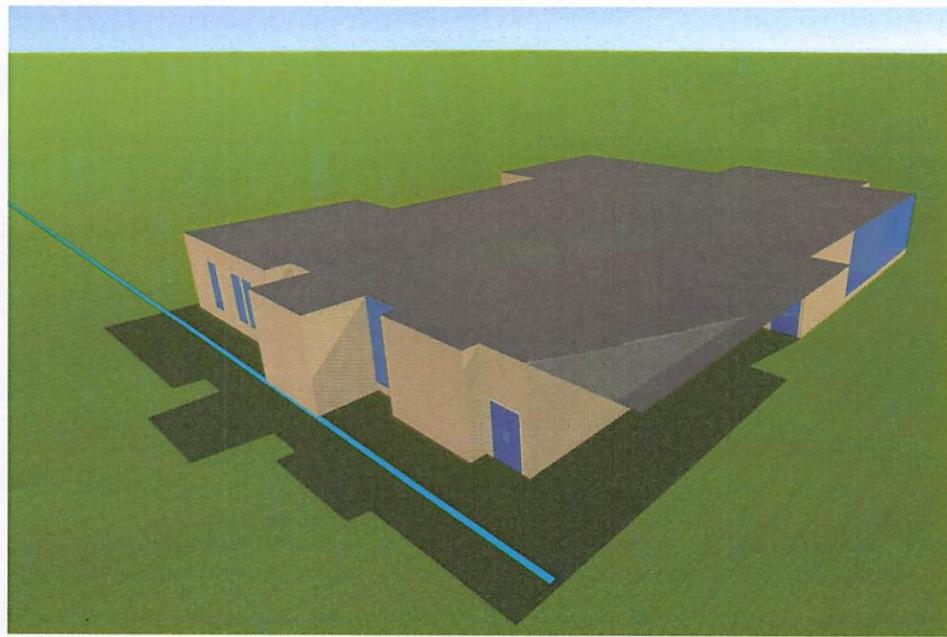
Trace 3D Building Model – Exterior, View Looking NE
